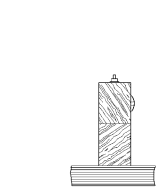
DETAIL OF FLEXIBLE GUARDRAIL DELINEATOR
